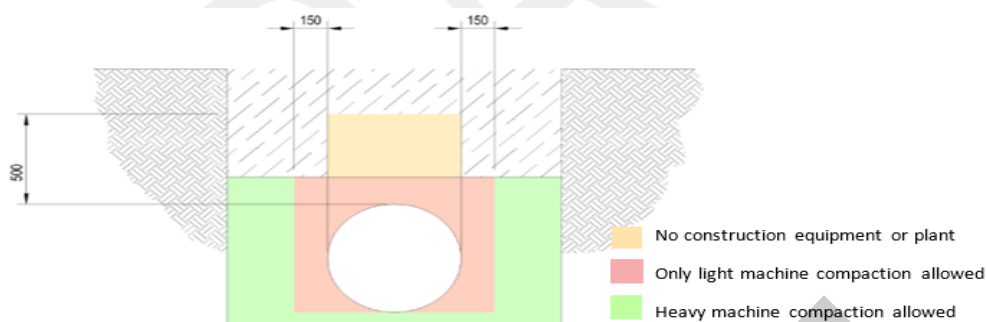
Areas where heavy machine compaction shall not be used (red area)
